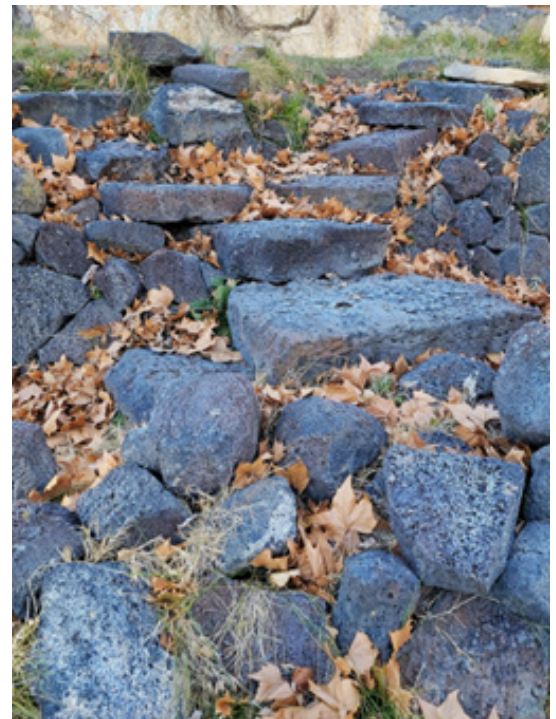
CCC-built lava-rock steps at Walcott State Park, Minidoka, Idaho, November 2021. Laura Woodworth-Ney, Photographer.
